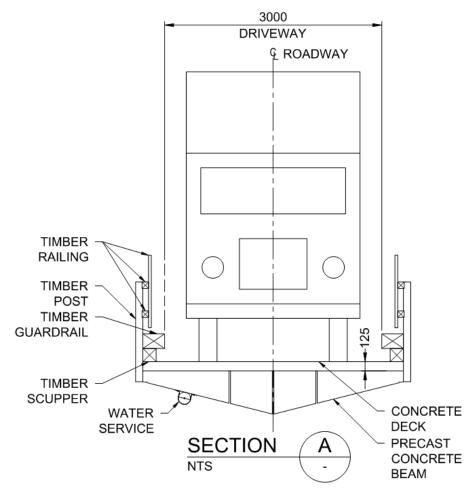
Lions Bay Avenue Bridge over Alberta Creek (Driveway) – Section
